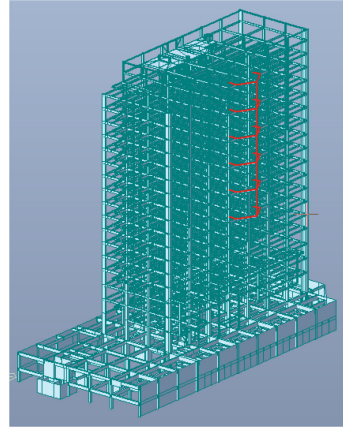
A Structural Model of Pure Long Span Curtain Wall
